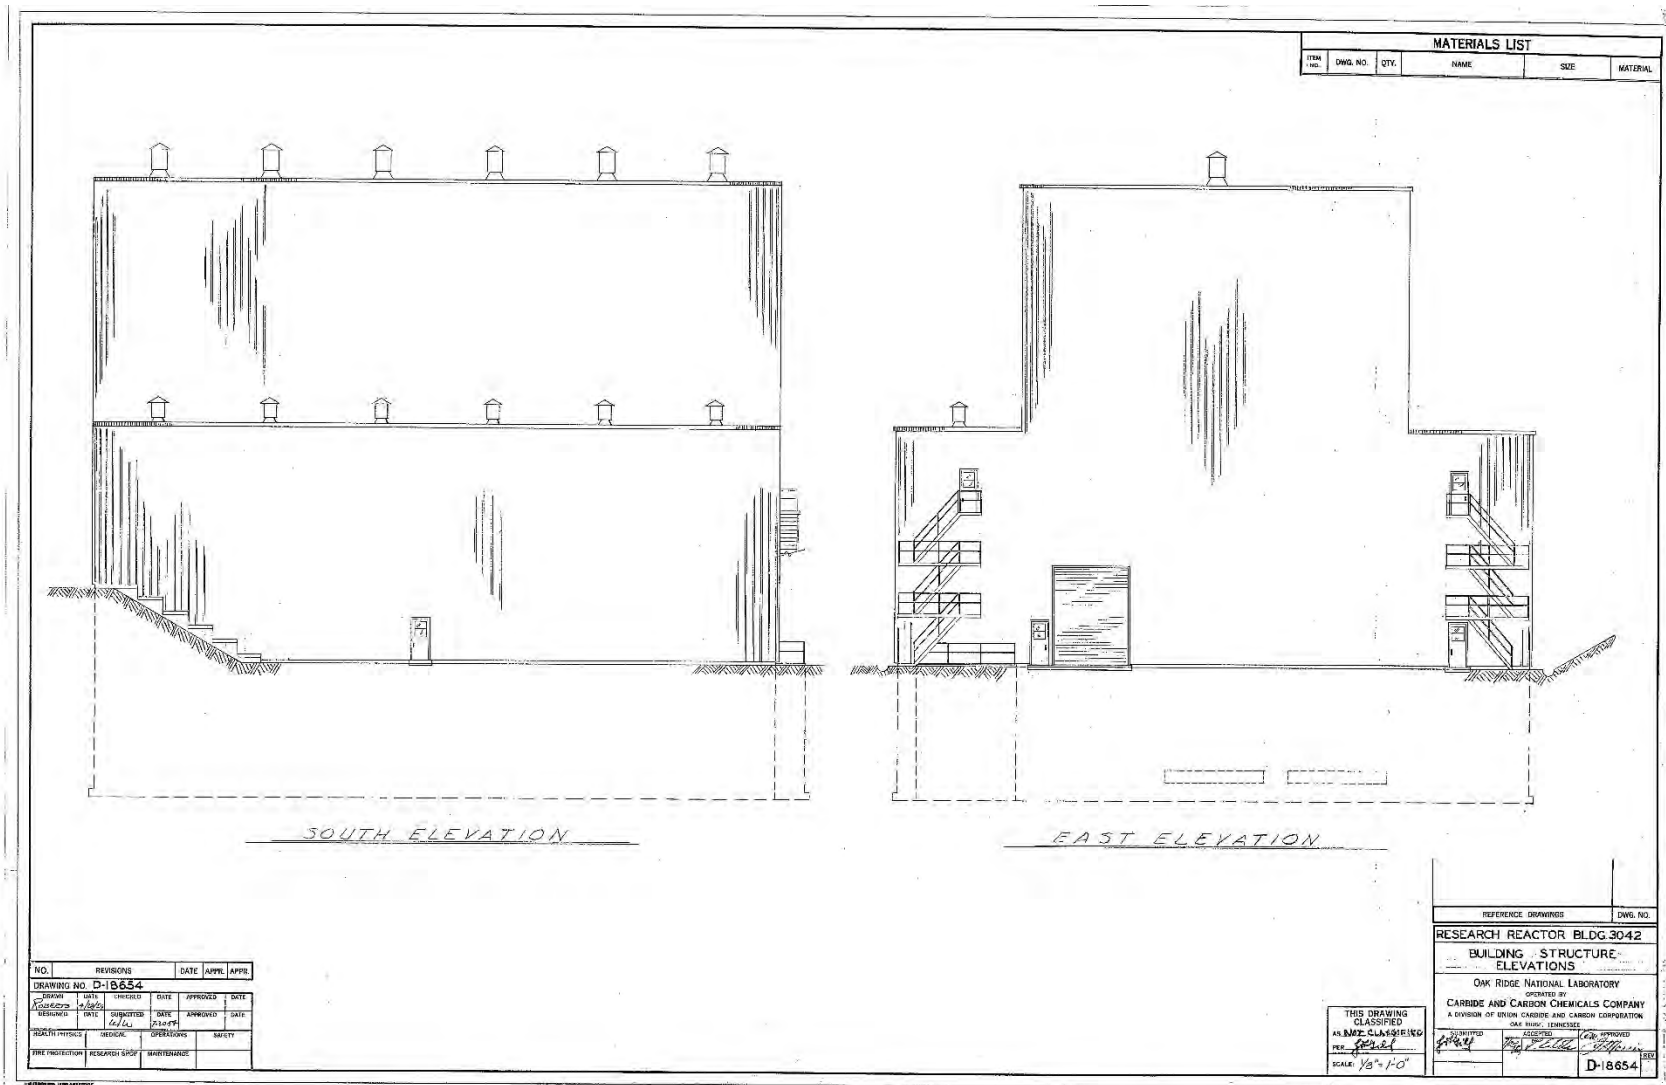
South and east elevations of Building 3042 (Oak Ridge National Laboratory, April 28, 1954).
